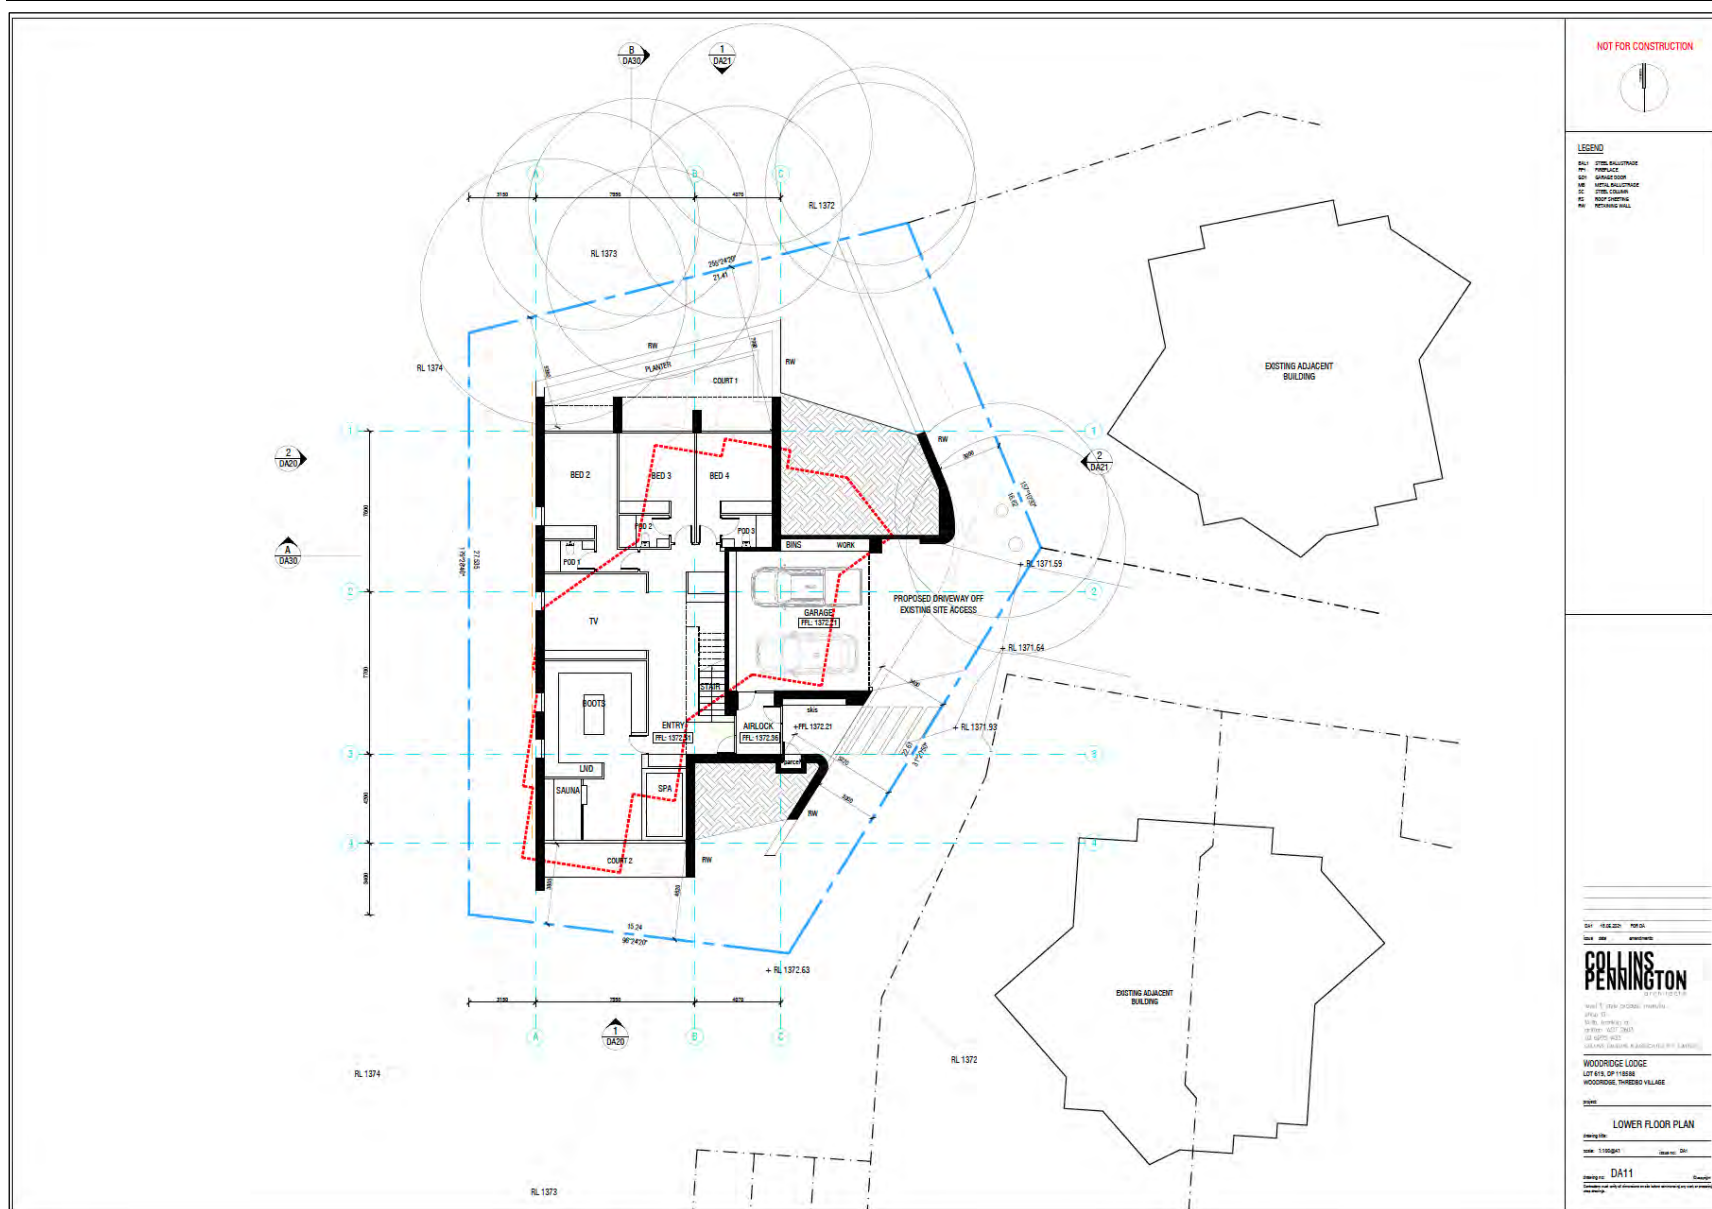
Proposed lodge lower floor plan. Red outline indicates existing lodge footprint (Collins Pennington Architects, 2021)
